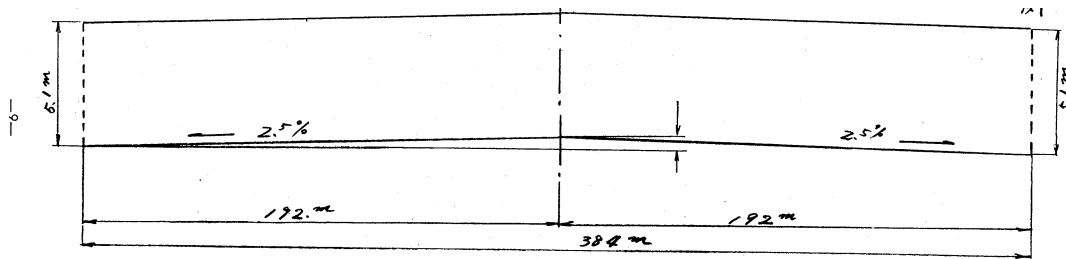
Longitudinal cross section of Futatsugoya tunnel
